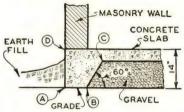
Footing for Lightweight Building Where Frost Is Not Present
